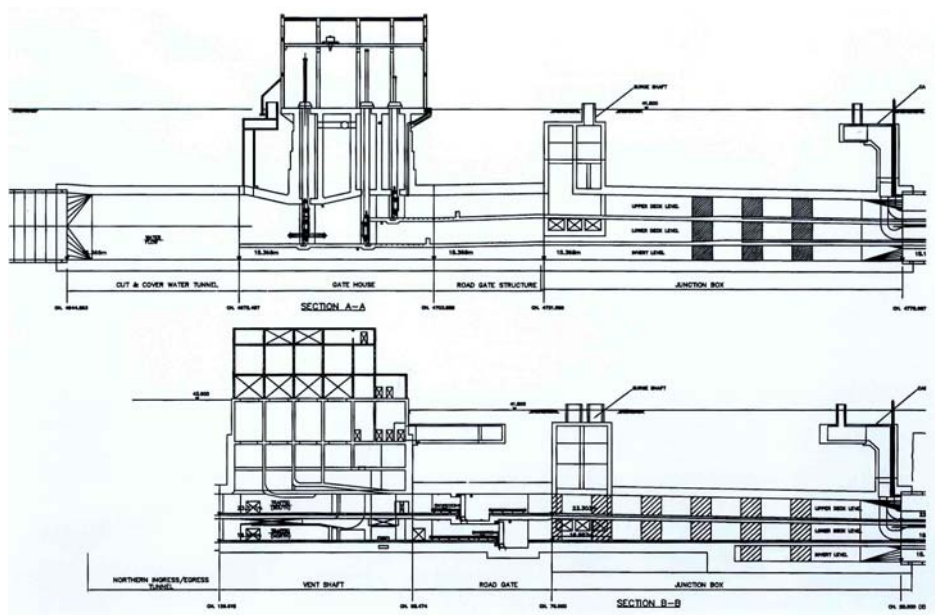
Gates Arrangement at North Junction Box and South Junction Box
